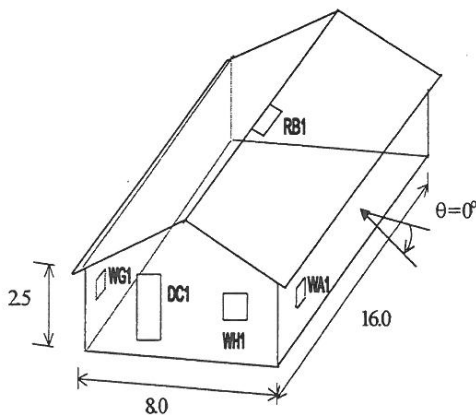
8 x 16 x 2.5 m low-set house and high-set house placed on 2.5m stilts (ie. 5.0m to eaves), tested at 1/50 in the wind tunnel. Roof pitch = 15°
